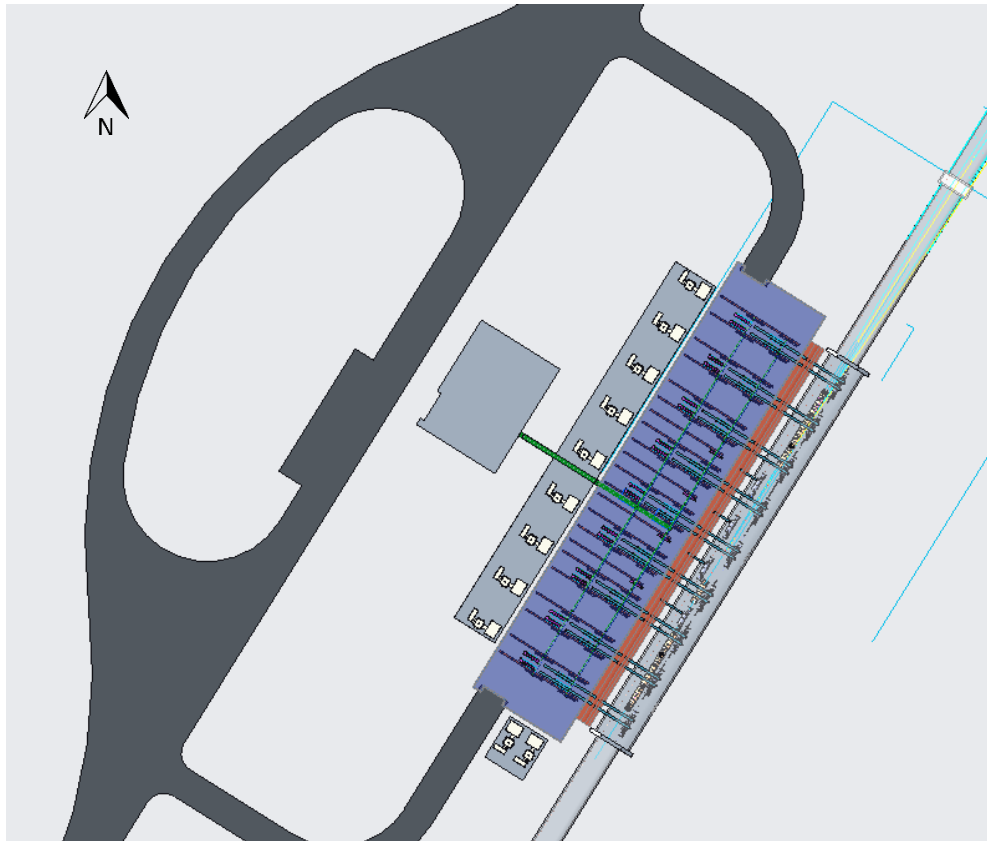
Final design of Building 1010 (gray) from previous summer's internship. Many components are outdated along with the floor plan of the building.
